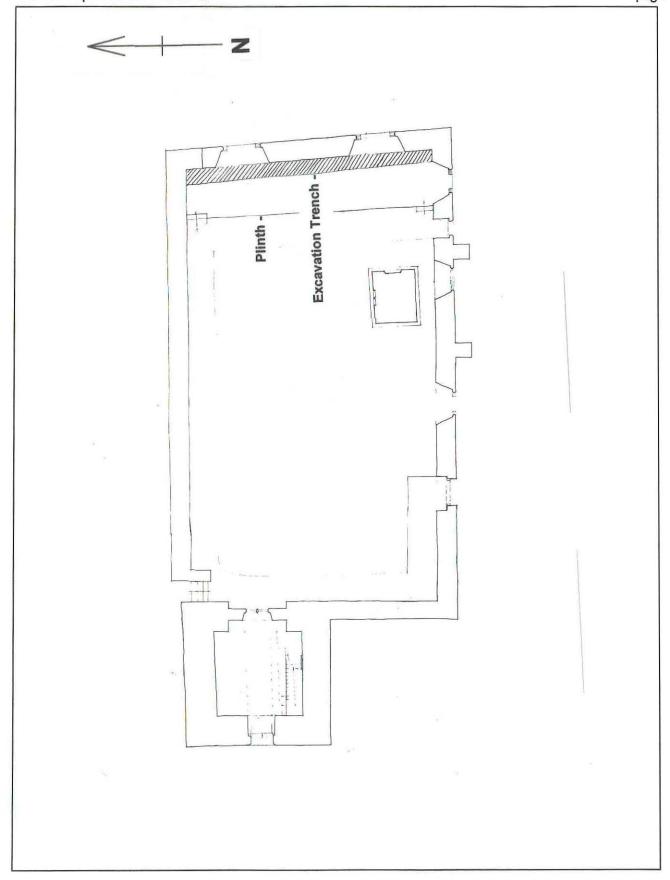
Plan of St Mary's Church Showing Trench in Interior of Chancel (Scale 1:200)
